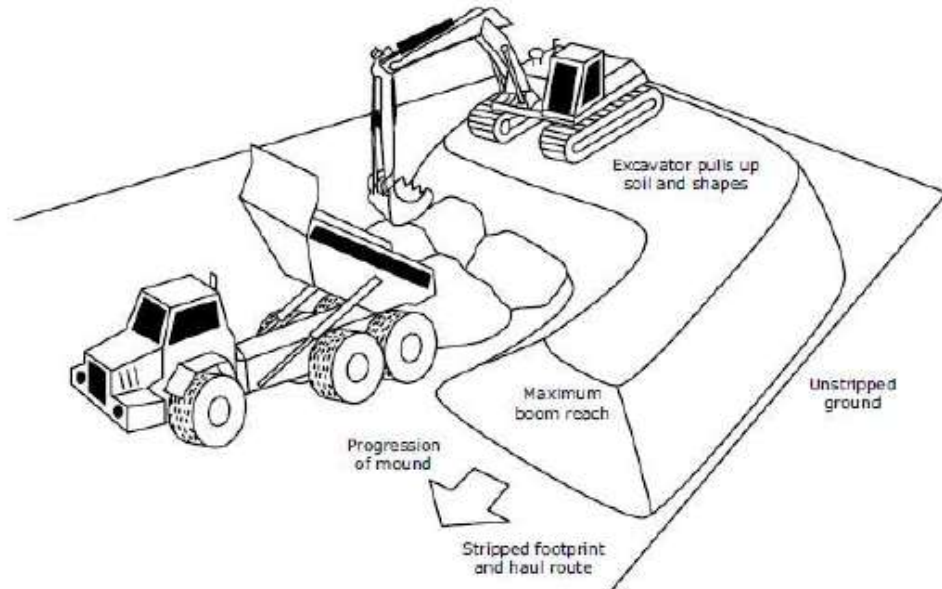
Soil storage mound construction with excavators and dump trucks: Single tier mound.
